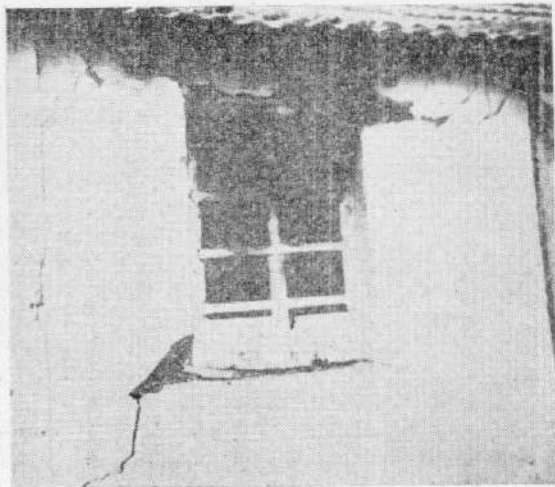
Extensive cracks from window and door opening propagating towards roof and foundation in masonry wall in House No. 6 in Henry's Masonry block No. 8,
